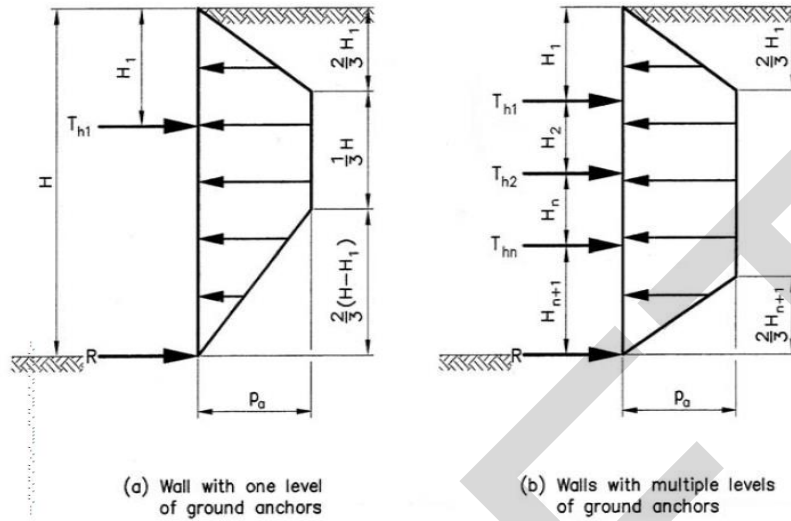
Apparent Earth Pressure Distributions for Anchored Walls Constructed from the Top Down in Cohesionless Soils
